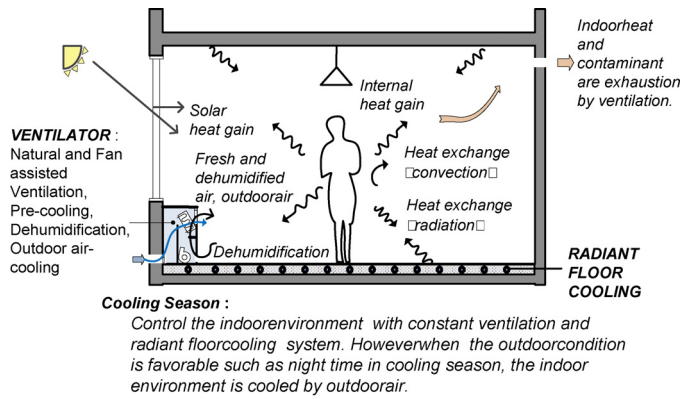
Concept of radiant floor cooling system with ventilation system.
